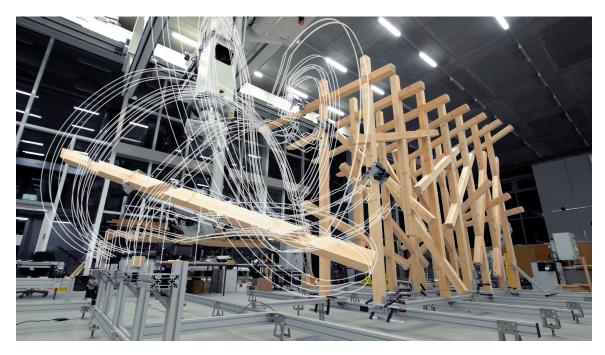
Image showing the final timber element being assembled in our case study. Three distributed clamps can be seen in the background already attached to the structure by the robotic arm. The assembly process is modeled with our flowchart and solved using our solver. Two linear and one free motion trajectory are used to bring the element from pickup to the clamps, shown here as overlaid white curves.
